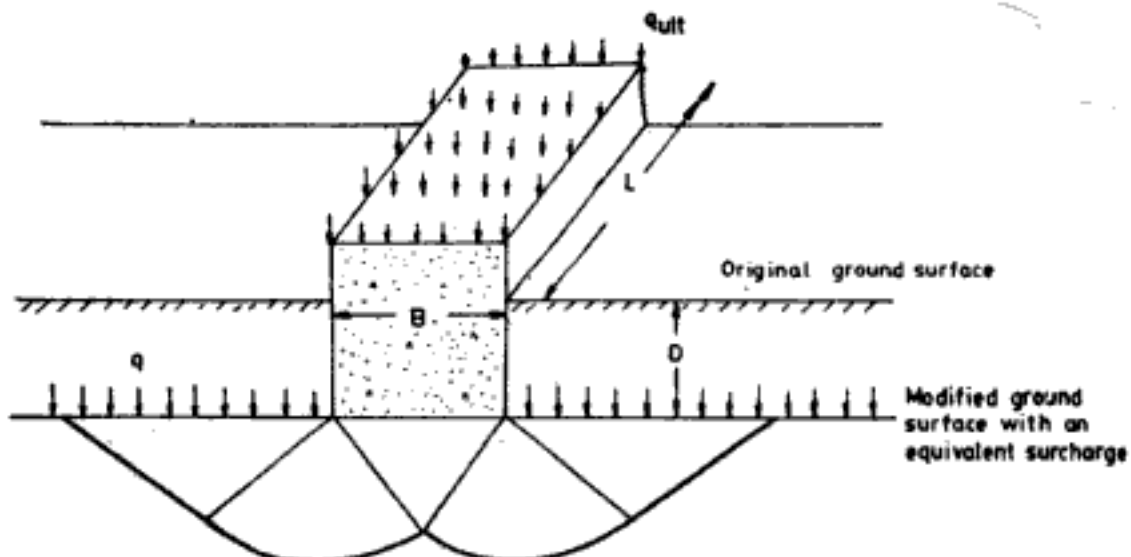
Failure pattern for strip footing in general shear failure
